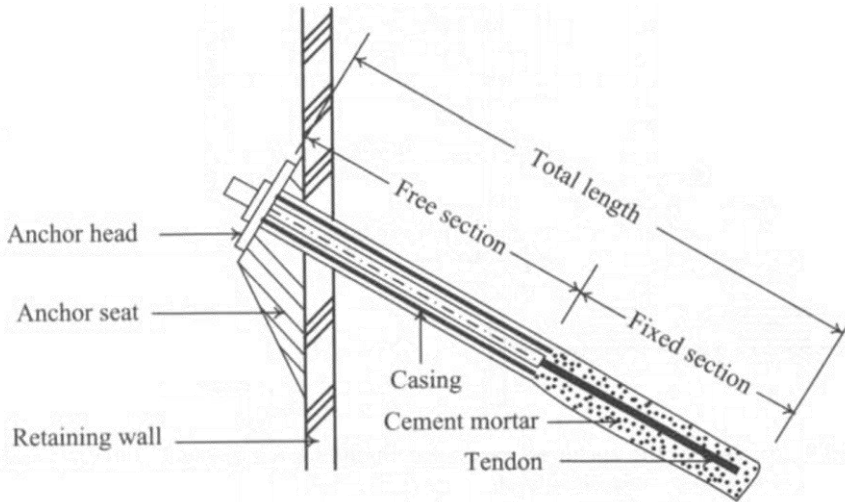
Grouted anchor general scheme (after Ou, 2006).
